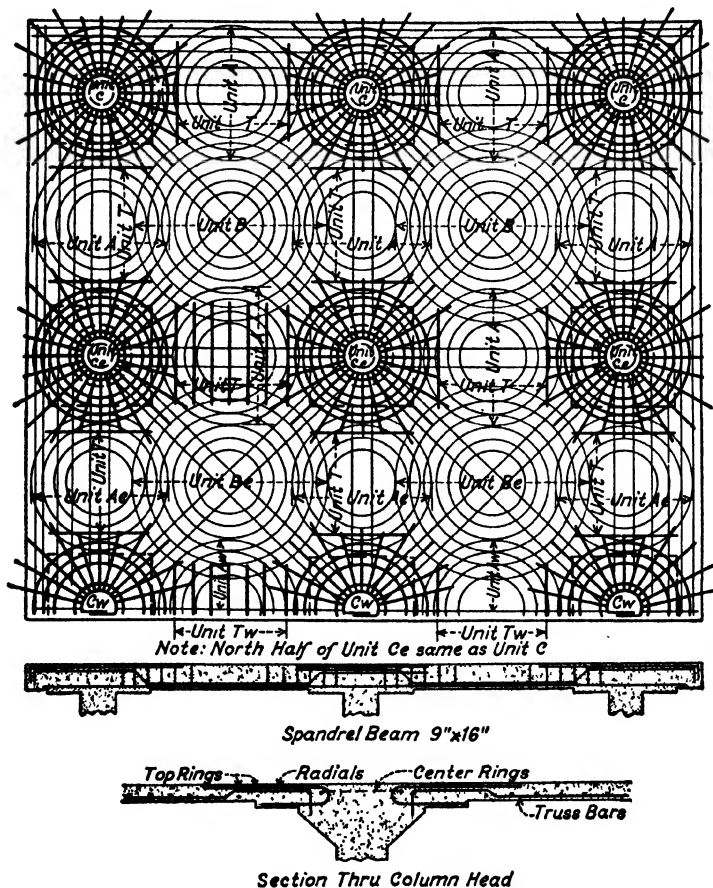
Arrangement of Reinforcement in Test Slab. (See p. 105.)
